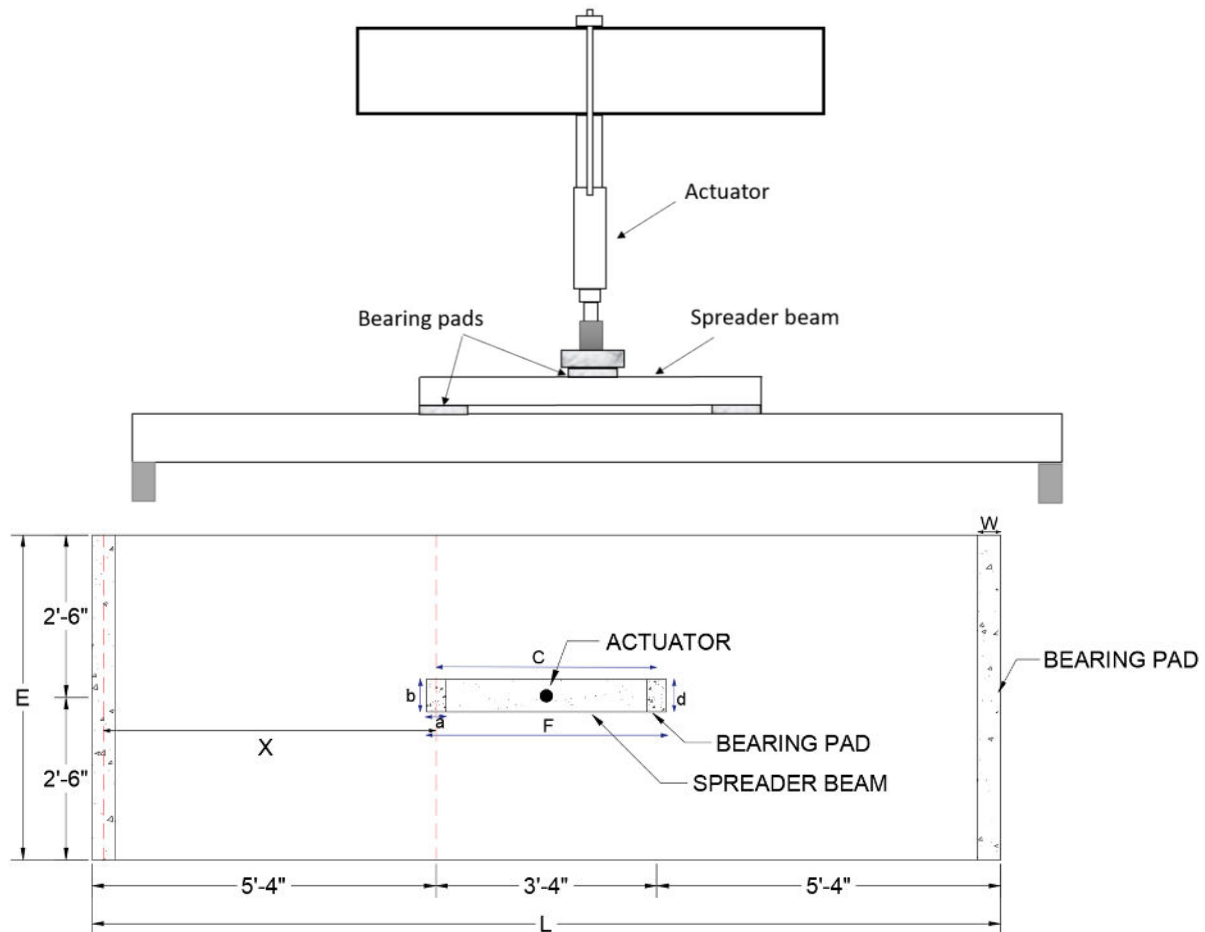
Elevation (top) and plan view (bottom) of flat slab test setup.
